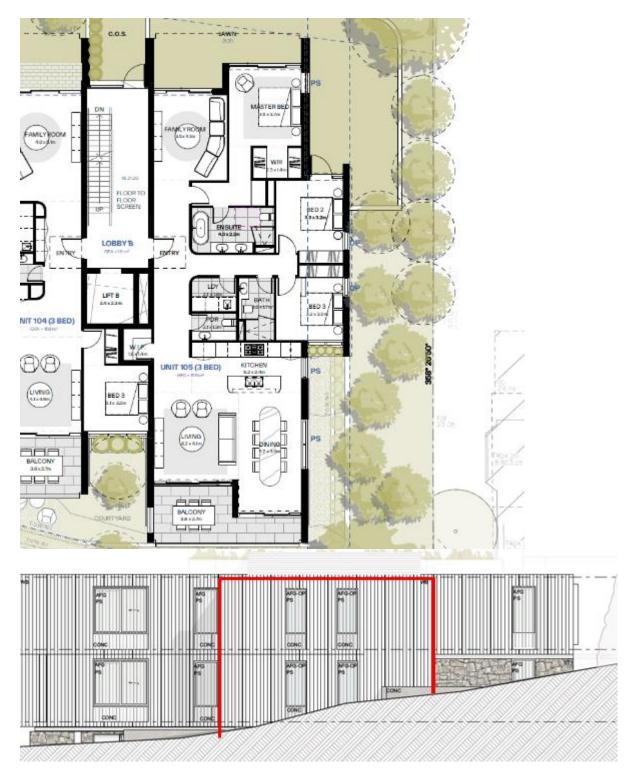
Plan extracts showing portion of eastern wall setback 4 metres from eastern boundary.
